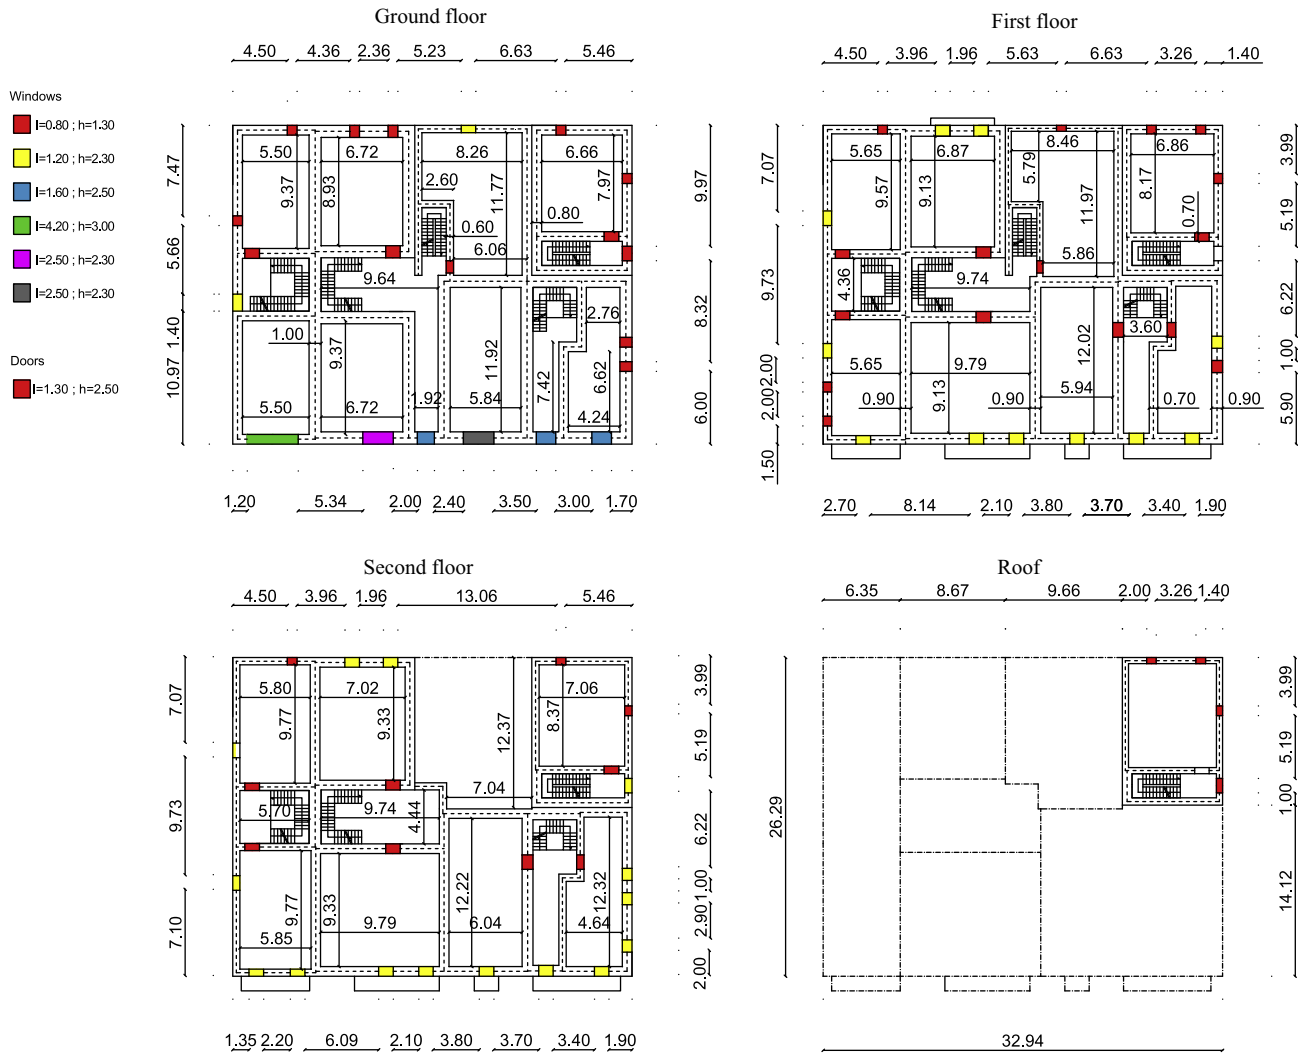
Plan layouts of the masonry compound in Torre del Greco.
